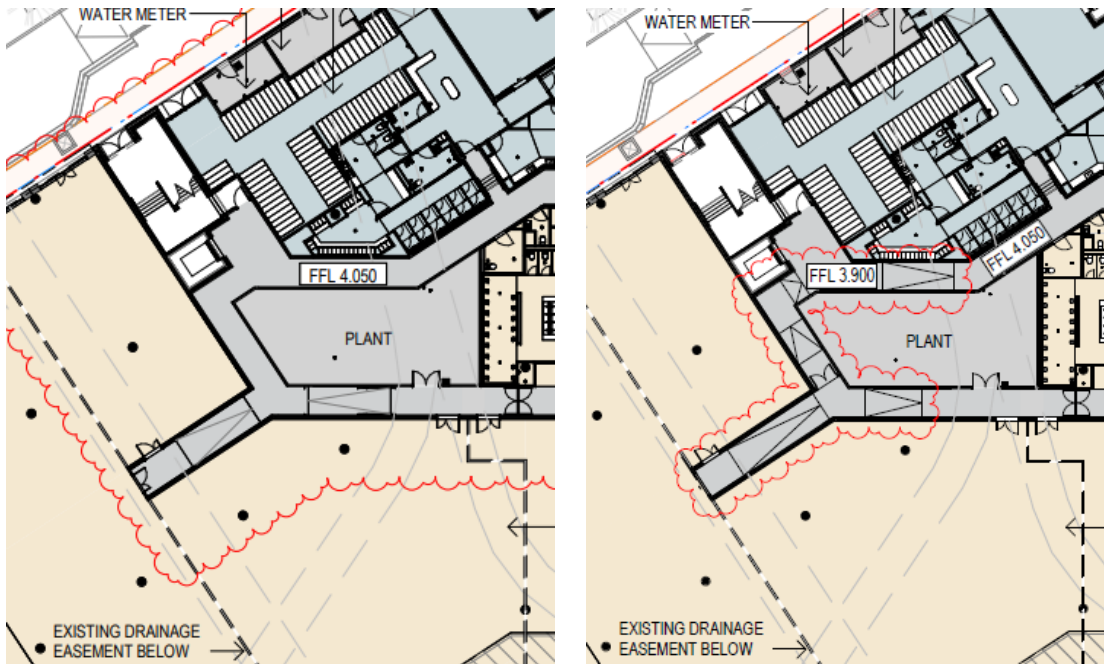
Back-of-house corridor adjustment; MOD 2 (left) and as proposed to be amended (right)
